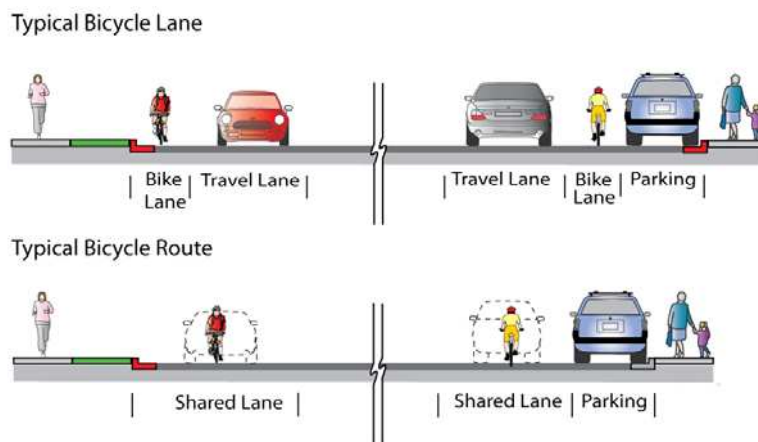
Typical bicycle lane and bicycle route accommodation with and without on street parking
